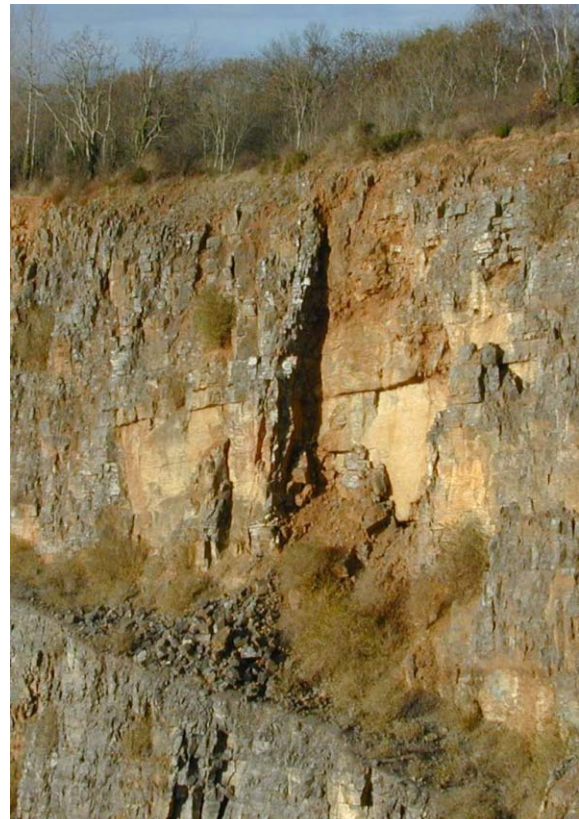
Choking of residual bench following face collapse and continued rockfall
